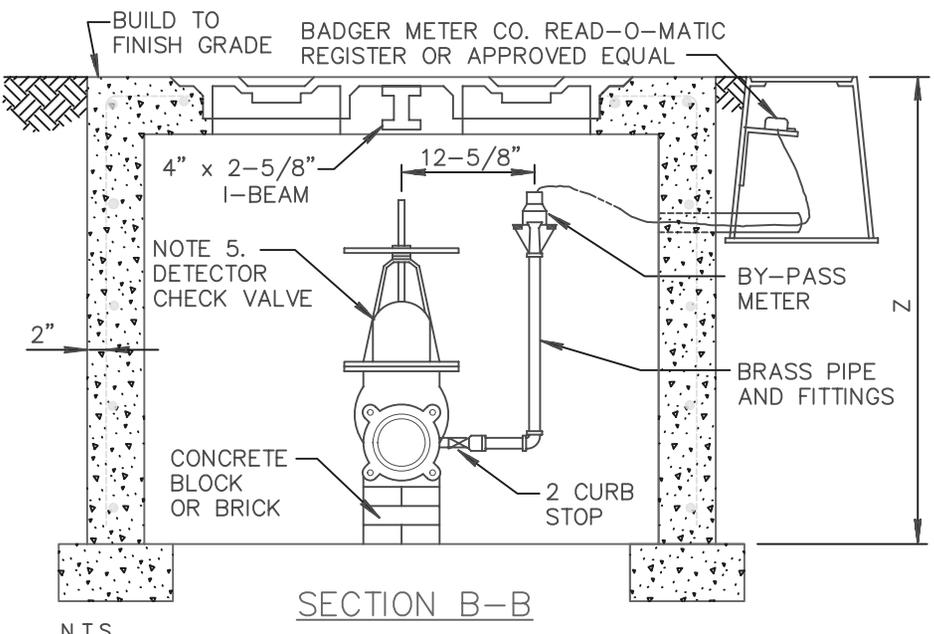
STANDARD DETAIL	3", 4", 6" WATER METER WITH ON-SITE FIRE HYDRANTS	CITY OF KINGMAN	DETAIL NO. 345-2
